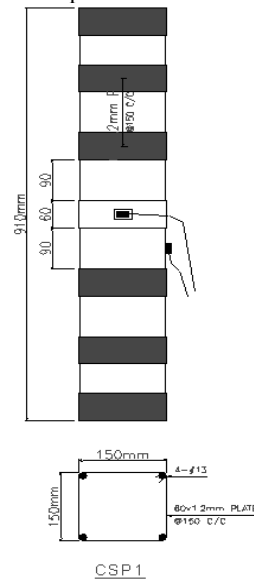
Overall dimension and reinforcement details of test specimen CSP1
